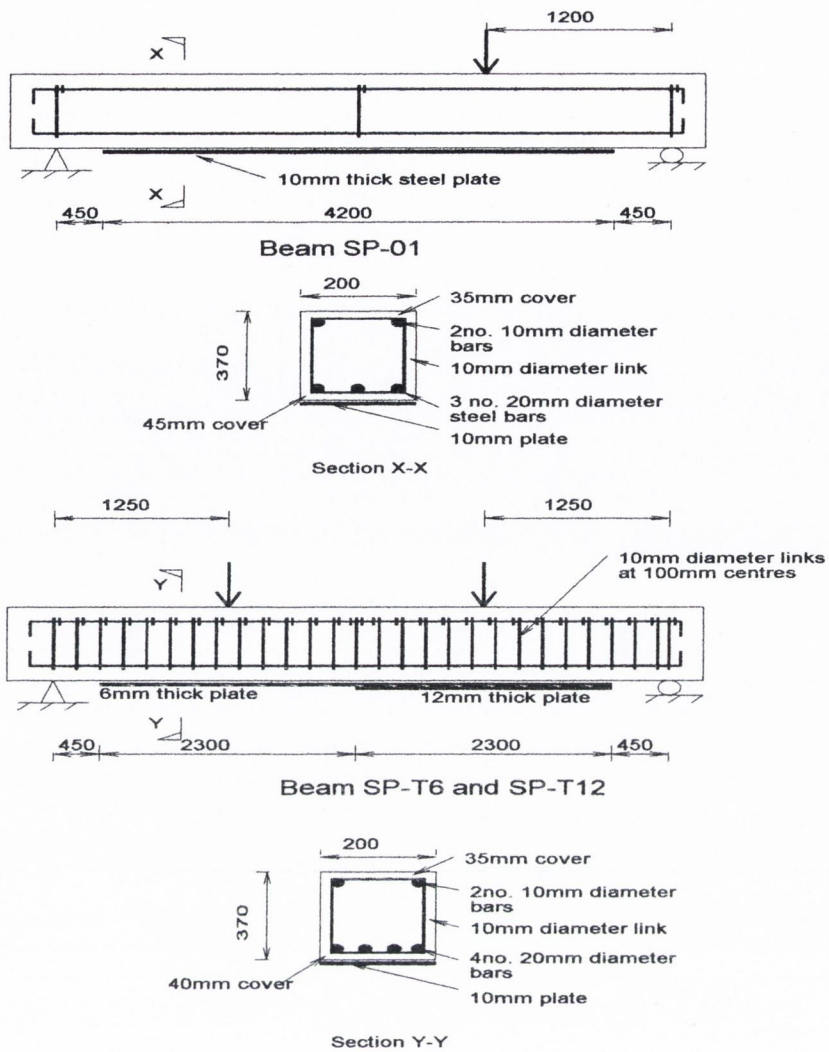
The two types of beams tested for shear peeling failure together with the beam sections. (Mohamed et al., 2001)
